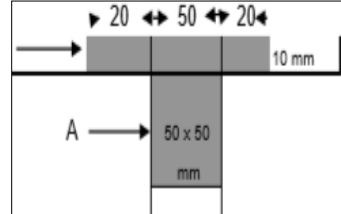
Execution of upstream face treatment (Racking, Cavity Filling, Injection Grouting and Raised Pointing)
